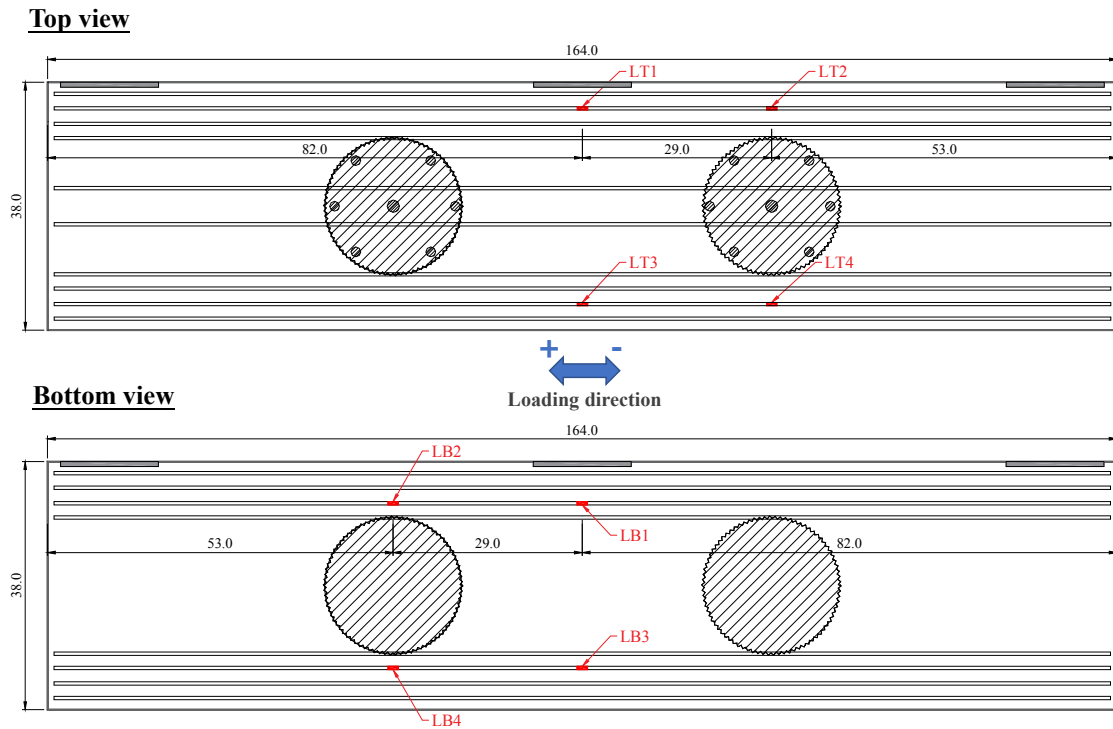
Strain gauges layout on the longitudinal reinforcement of the cap beam.
